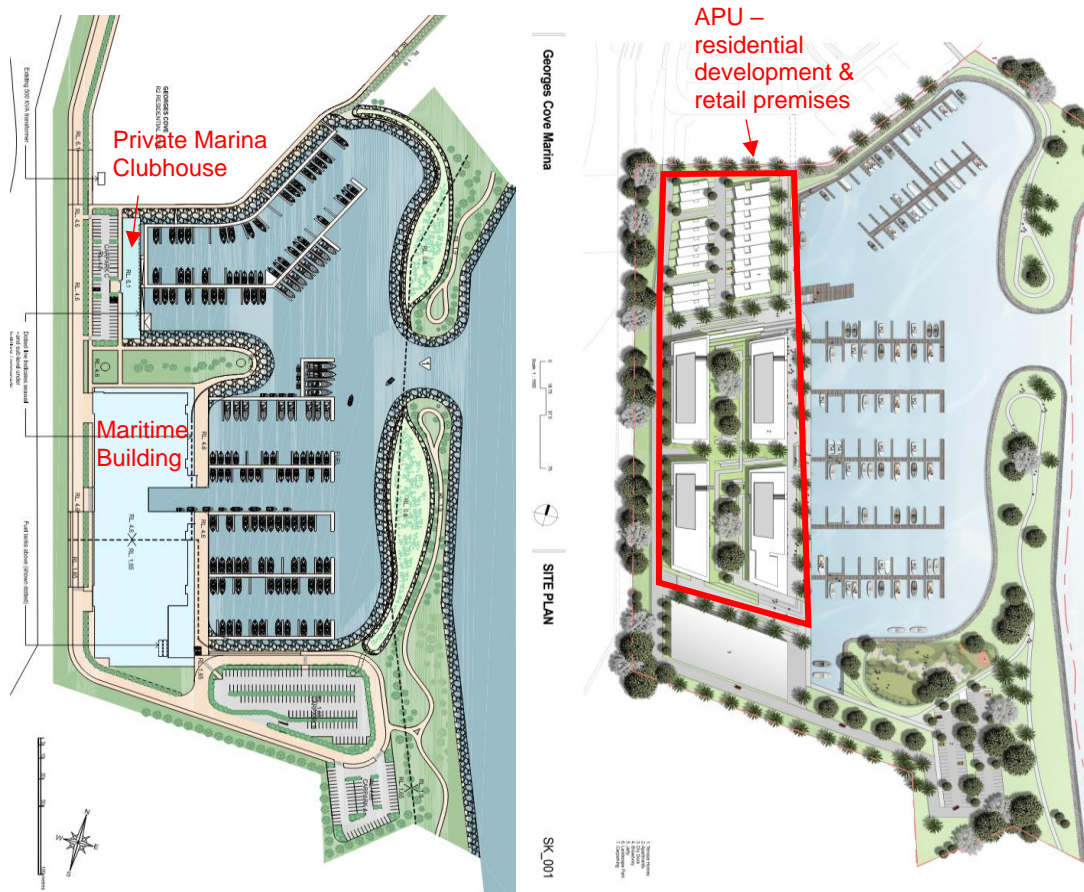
(L) DA-611/2018 General Layout Site plan (R) Excerpt of Site Plan (Attachment 10 - Concept Urban Design Plans)
